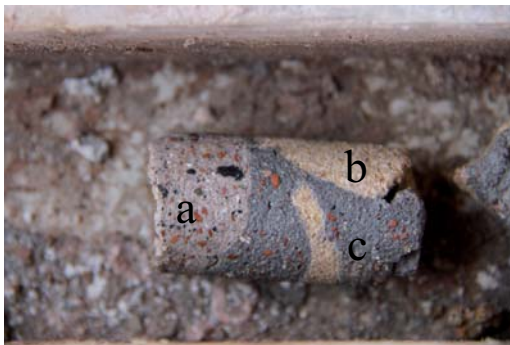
Core Sample. Detail. a) Joint Fill, b) Stone, and c) Grout.
